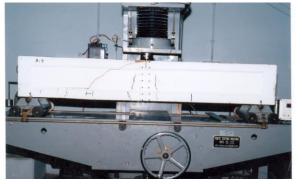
& 11: I-section & Rectangular beam are tested on Torsee Testing Machine
